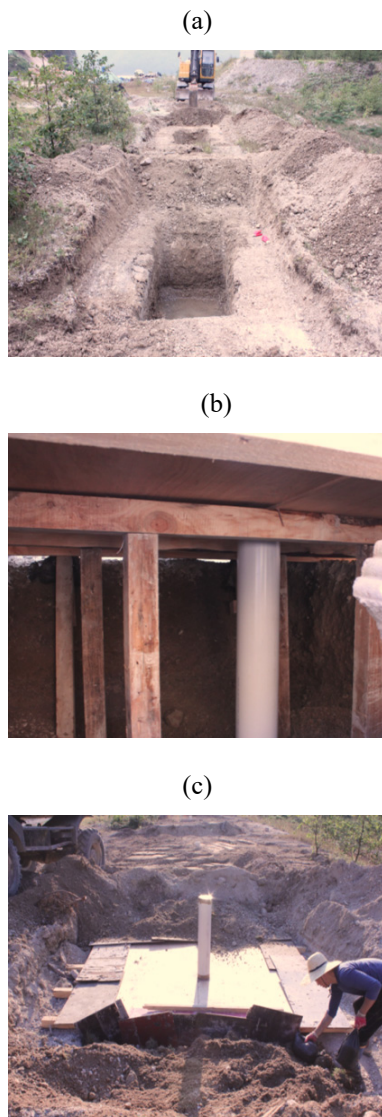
Preparation of the underground blasting experiment: (a) excavation; (b) support installation; (c) pipe installation
